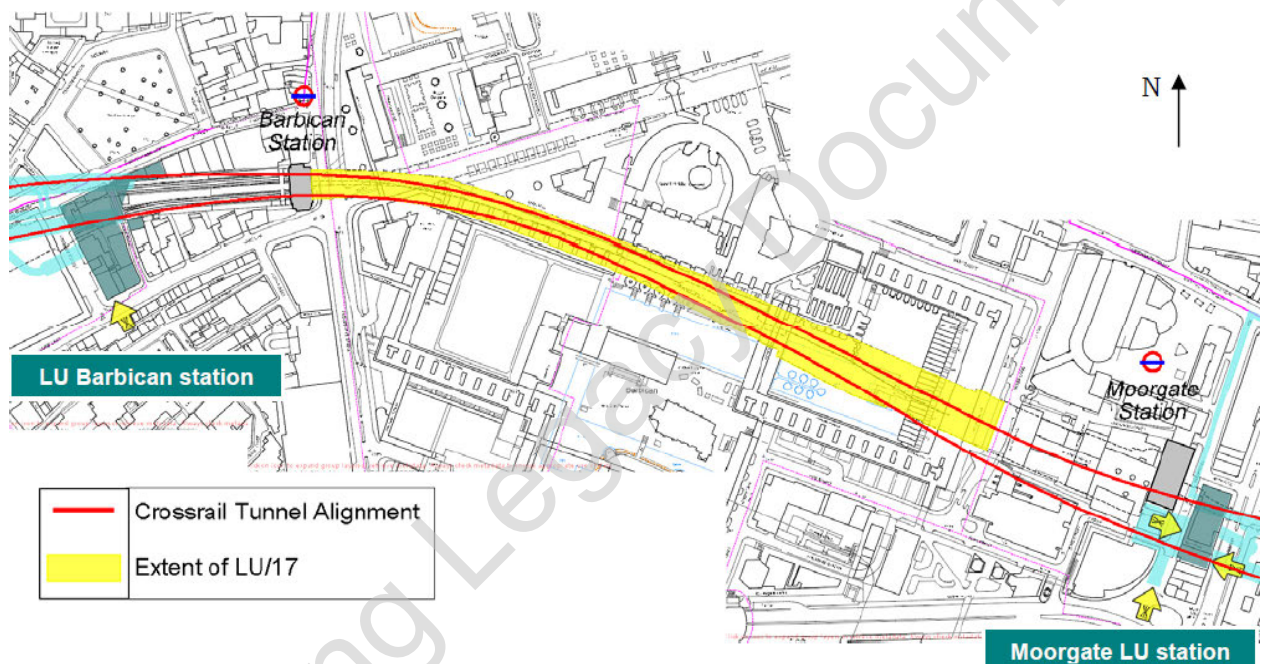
Location Plan for LU/17 in relation to CRL TBM tunnels alignment. Cross Passage CP5a is not shown on this plan (see Appendix C).
